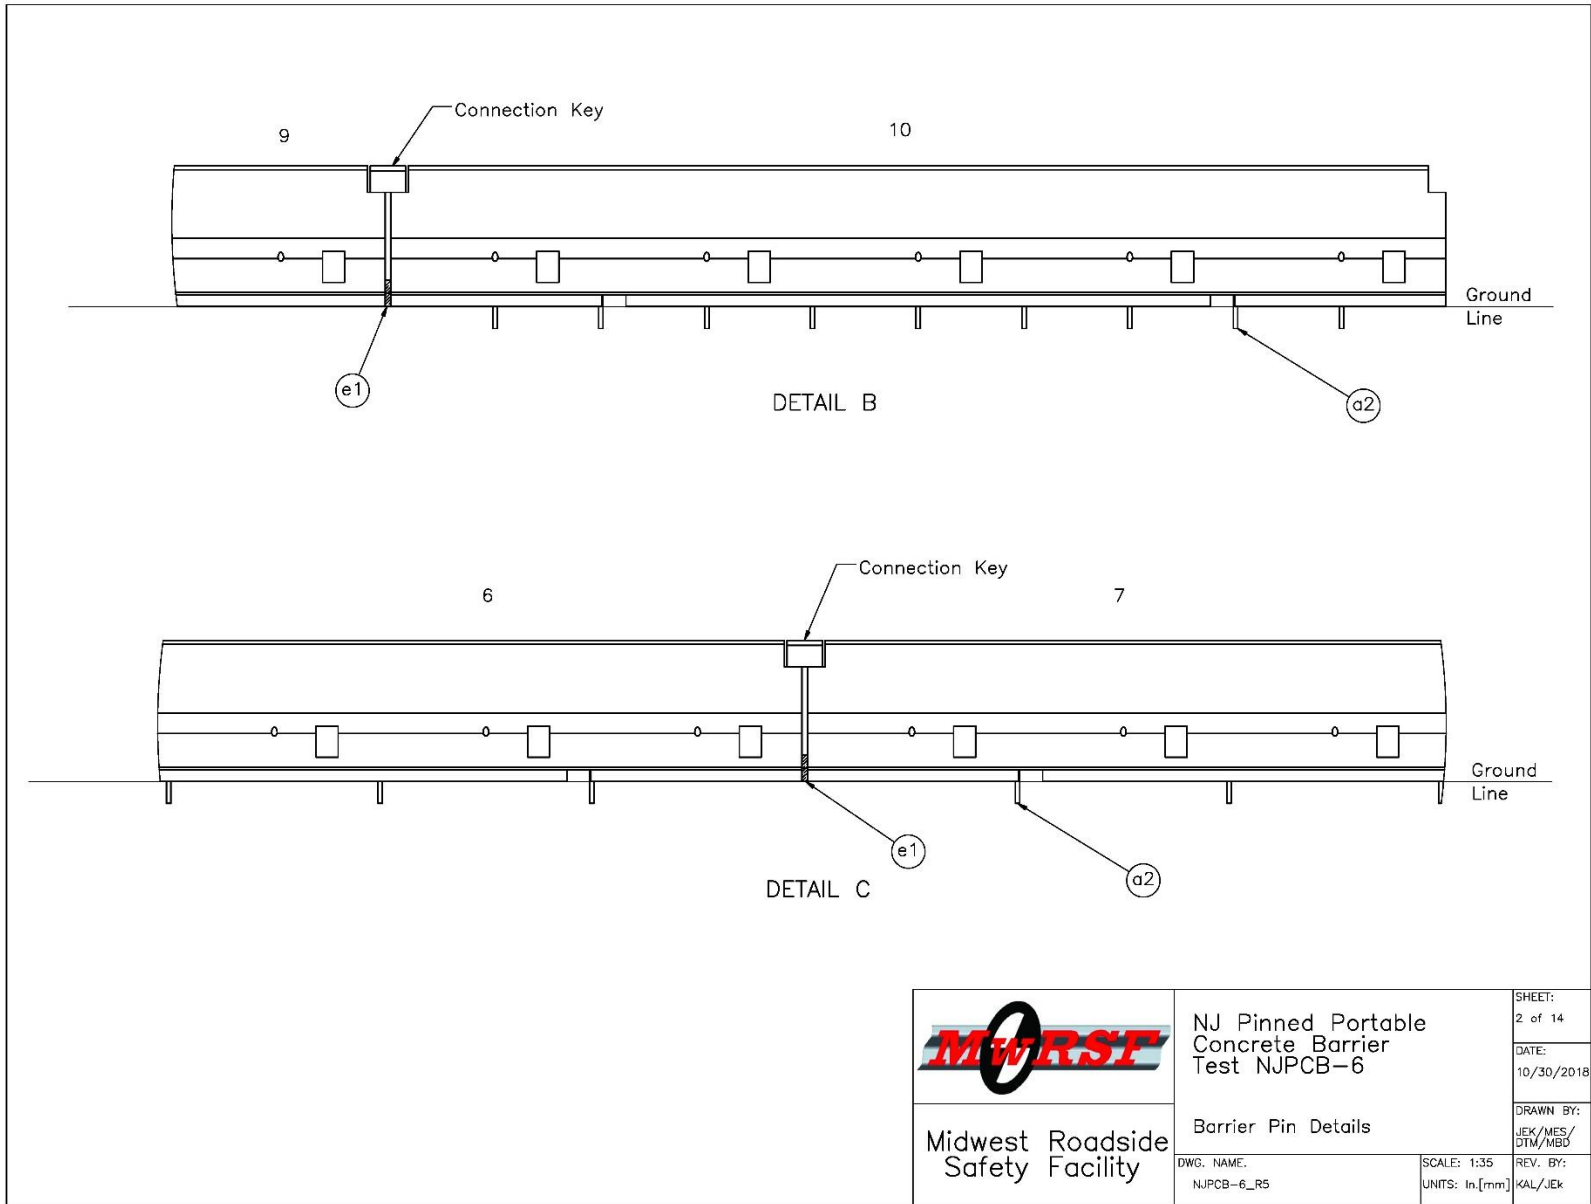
PCB Pin Anchor Details, Test No. NJPCB-6
